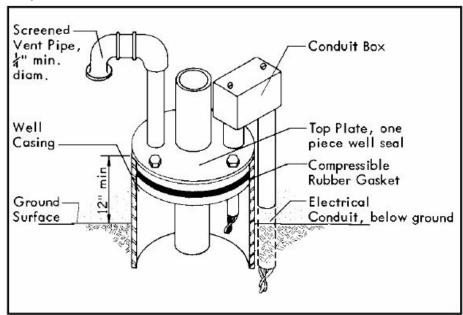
Diagram of well seal installation. The only difference in our installation is that the cables will not be underground, but rather, will follow the bottom of the piping into the electrical room.
